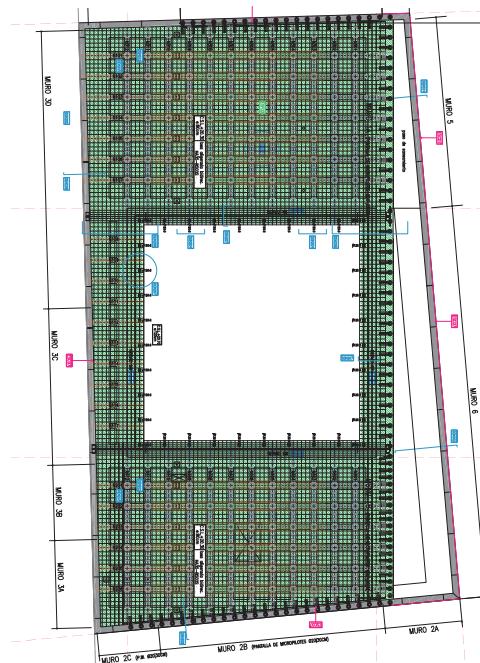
Plan defining the concrete slab. Own source. 2018. ©trasbordo / Figura 9. Plano de definición de la losa de hormigón. Elaboración propia. 2018. ©trasbordo.
